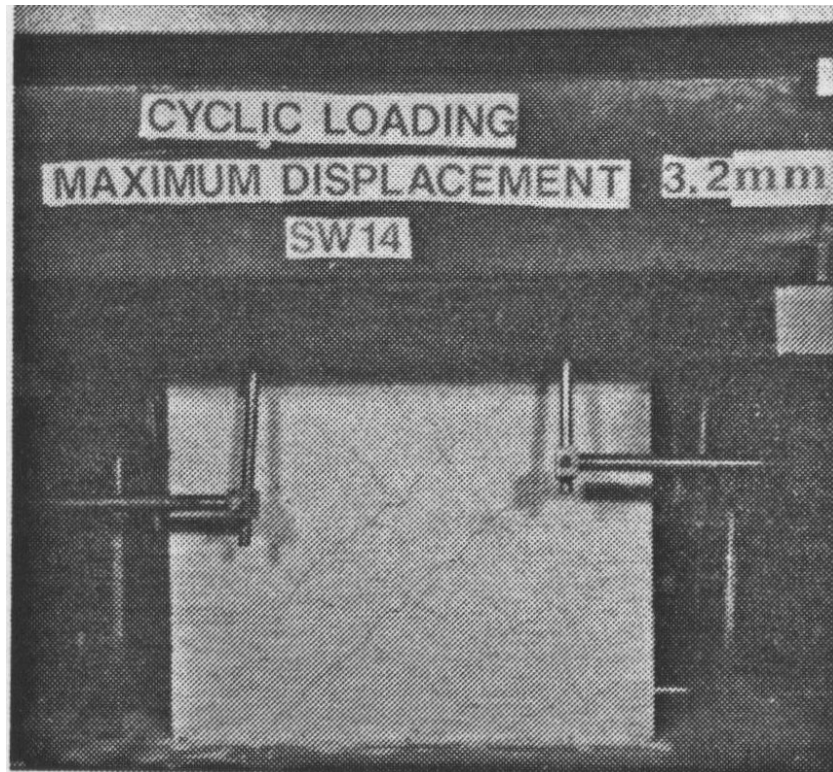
Condition of wall SW14 at 0.65% drift [Lopes and Elnashai (1991)]
